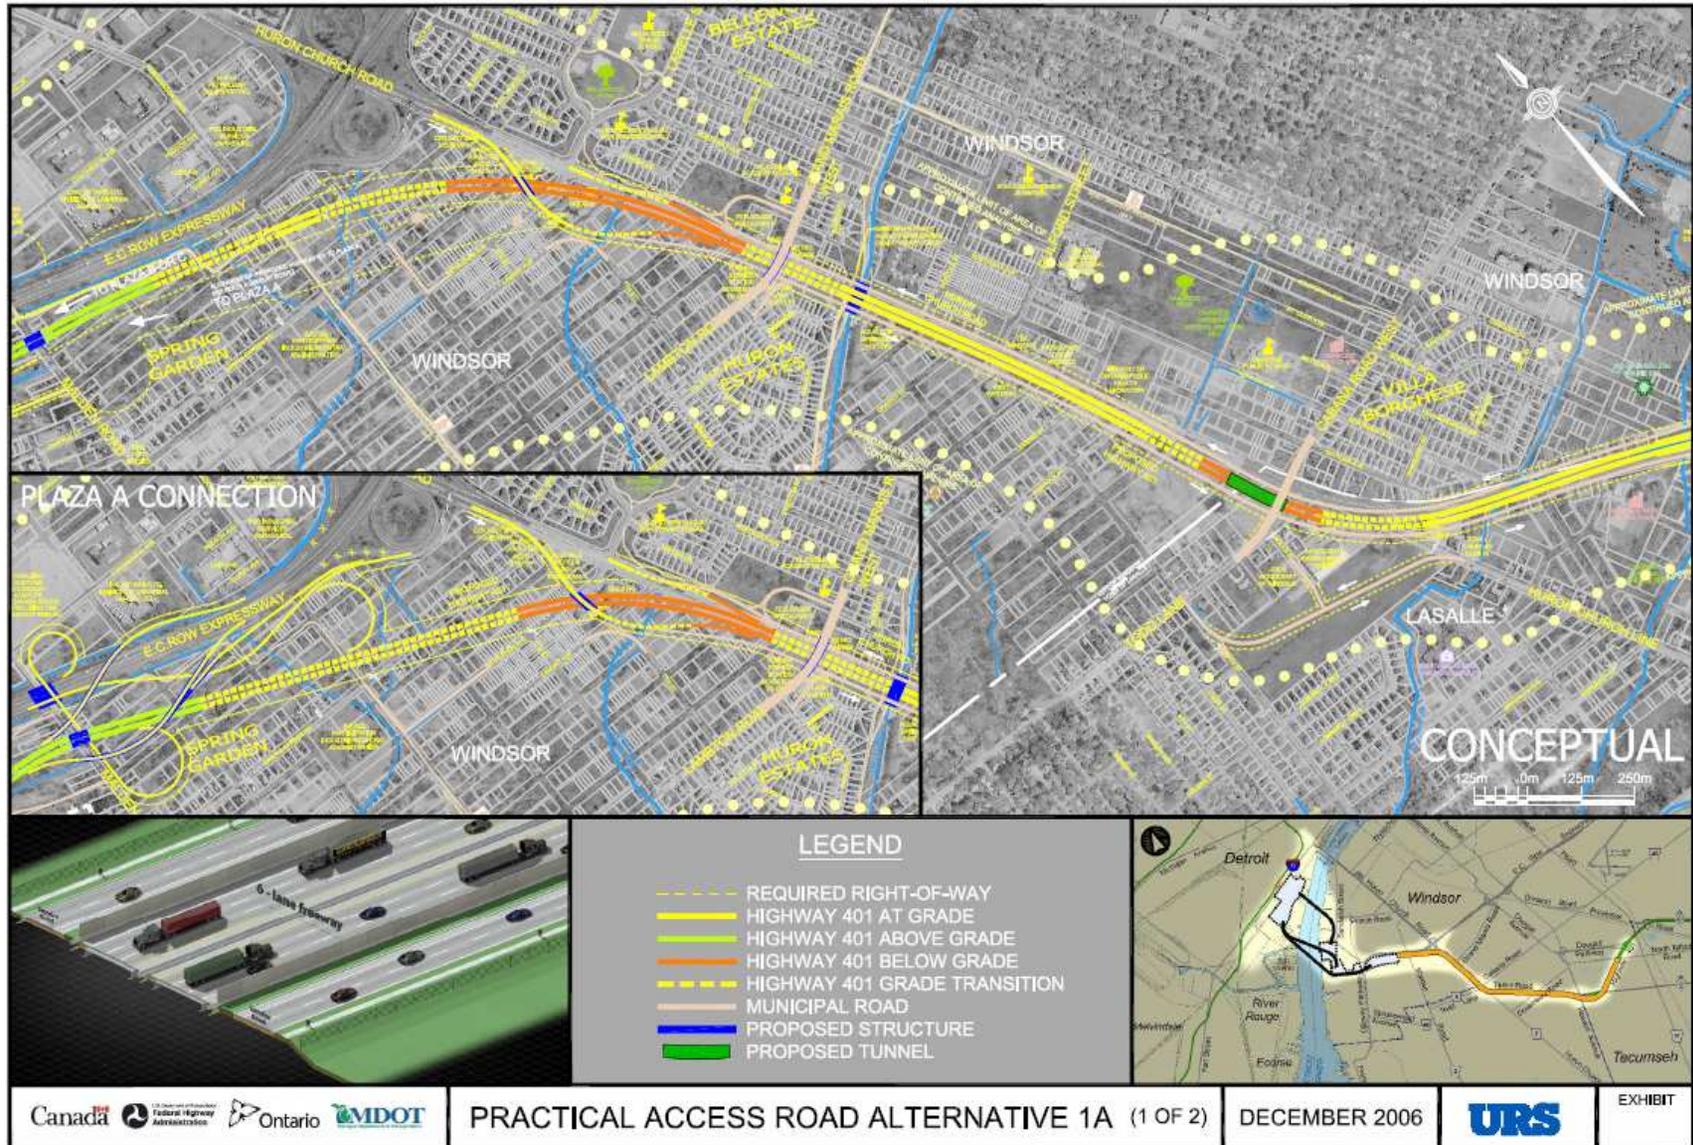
PRACTICAL ACCESS ROAD ALTERNATIVE 1A
